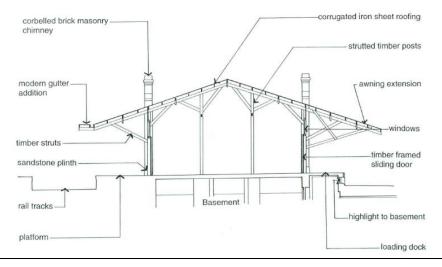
Typical Section Through Inwards Parcel Shed, Sydney Terminal
